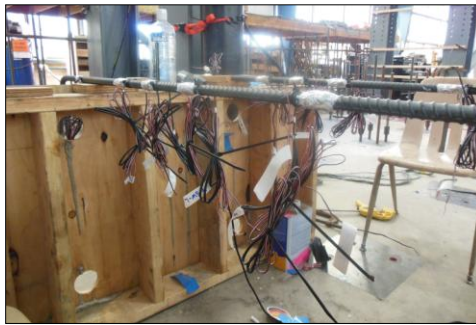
Photograph of strain gages on longitudinal column rebar
